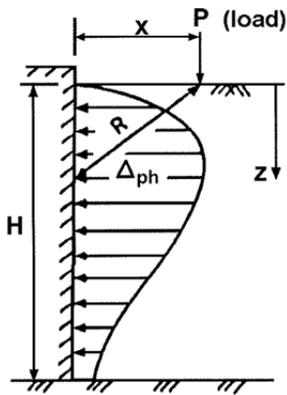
Horizontal Pressure on a Wall Caused by a Point Load.
